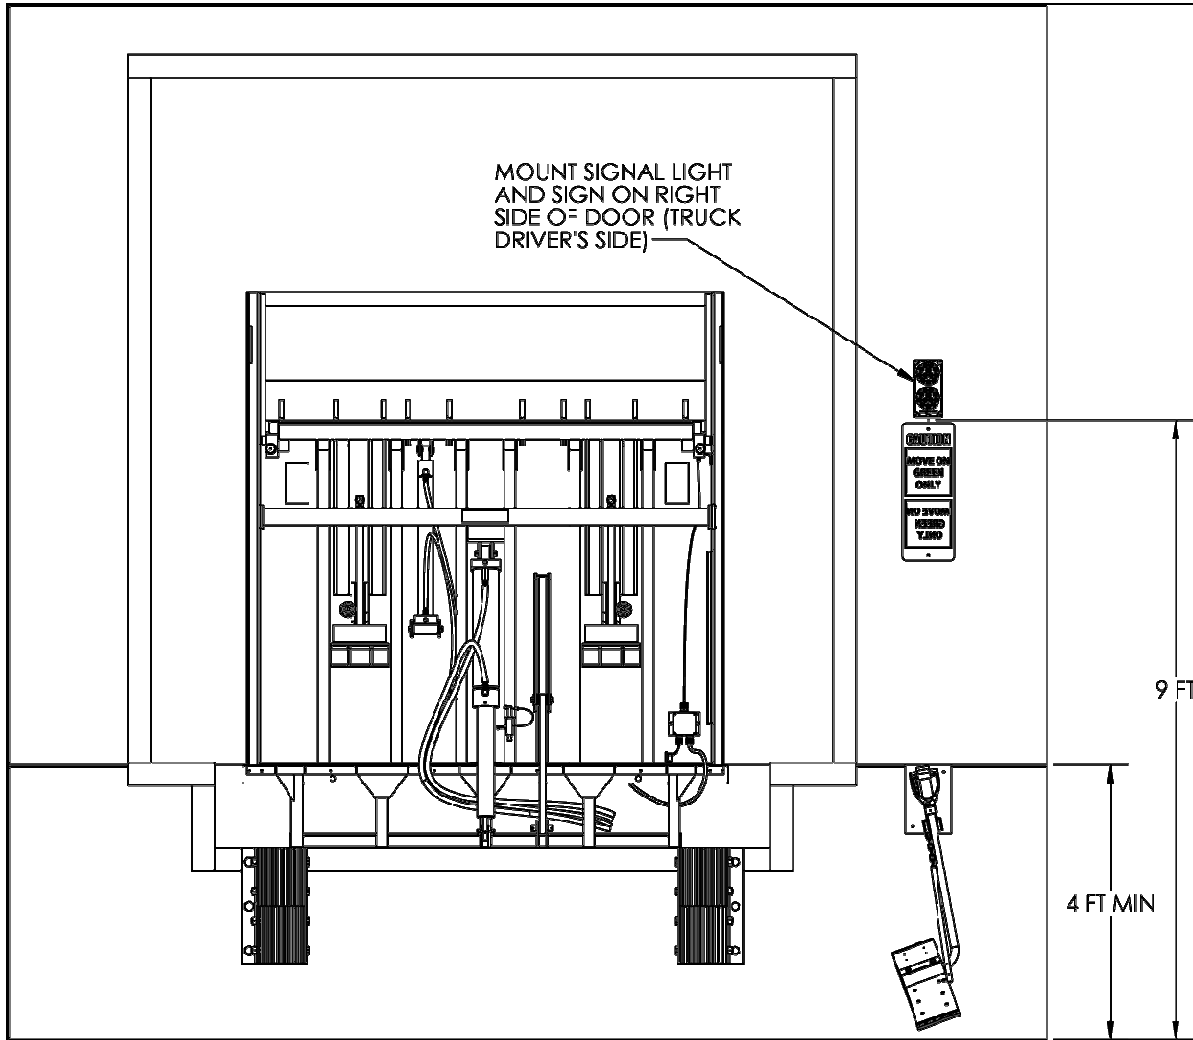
Typical Mounting Station, Outside Light and Sign Placement
